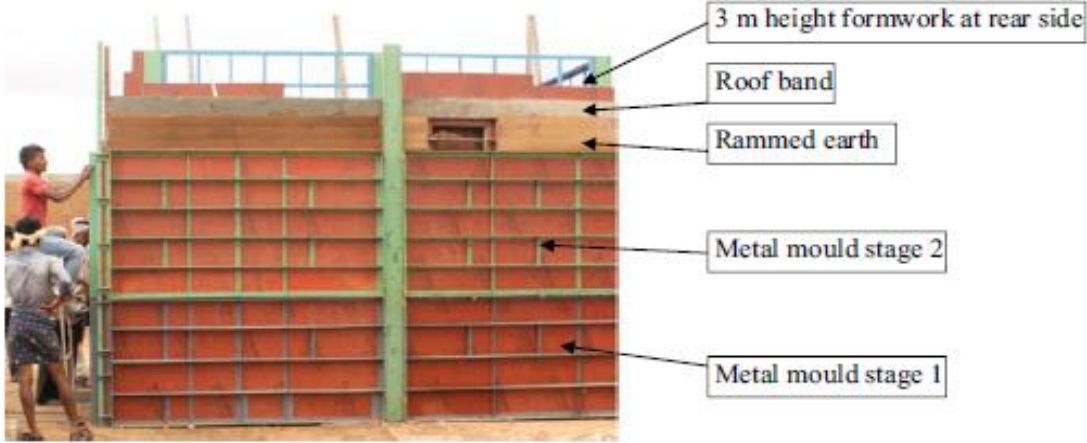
Metal formwork for rammed earth wall construction (Venkatarama Reddy, 2022)
